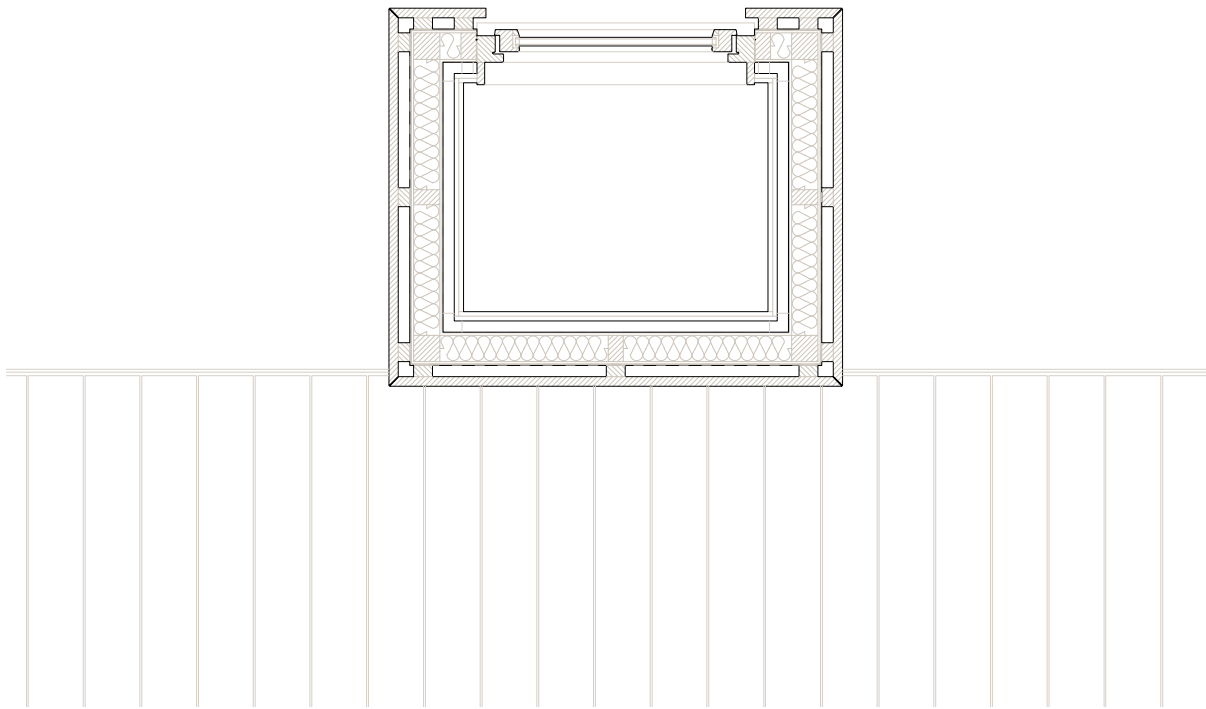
Detail 5: Terrace connection with facade wall and different slab 1:20
